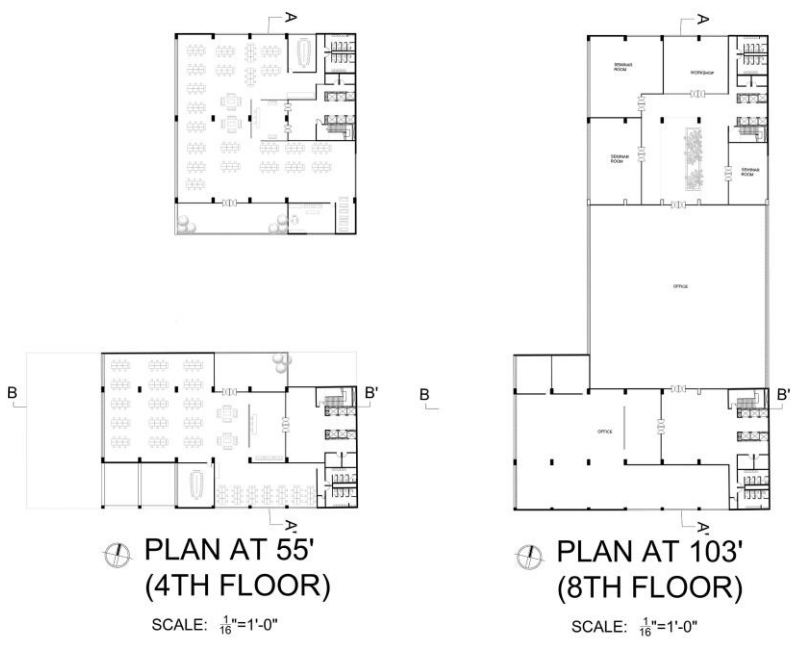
4<sup>th</sup> and 8<sup>th</sup> floor plan
